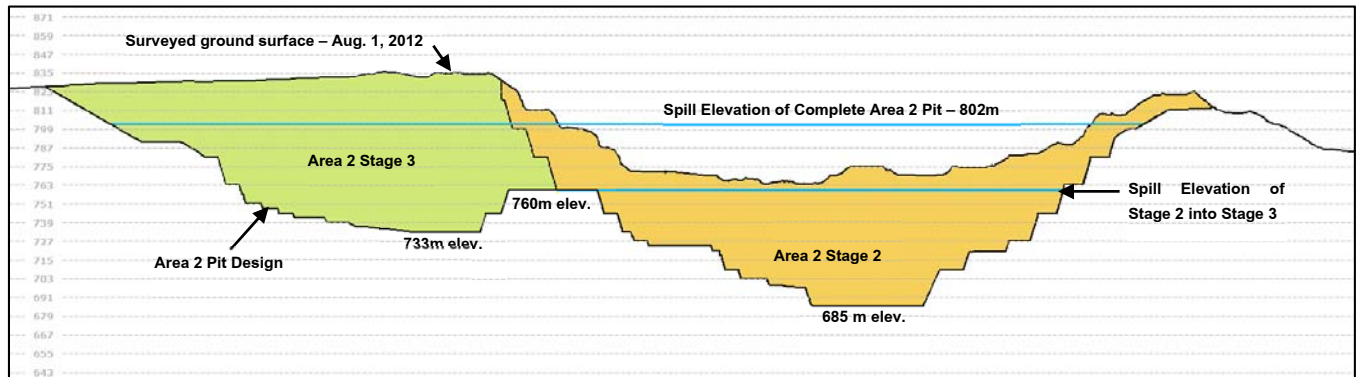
Section through Area 2 Pit Showing Staging and Spill Elevations.
